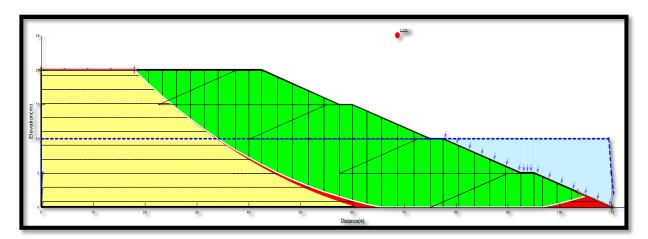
Embankment cross section for 1:3 slope at 5 m water level
